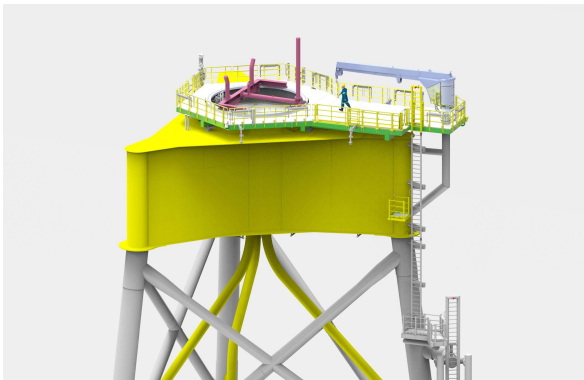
Guide frame is pre-mounted on jacket flange [14]
